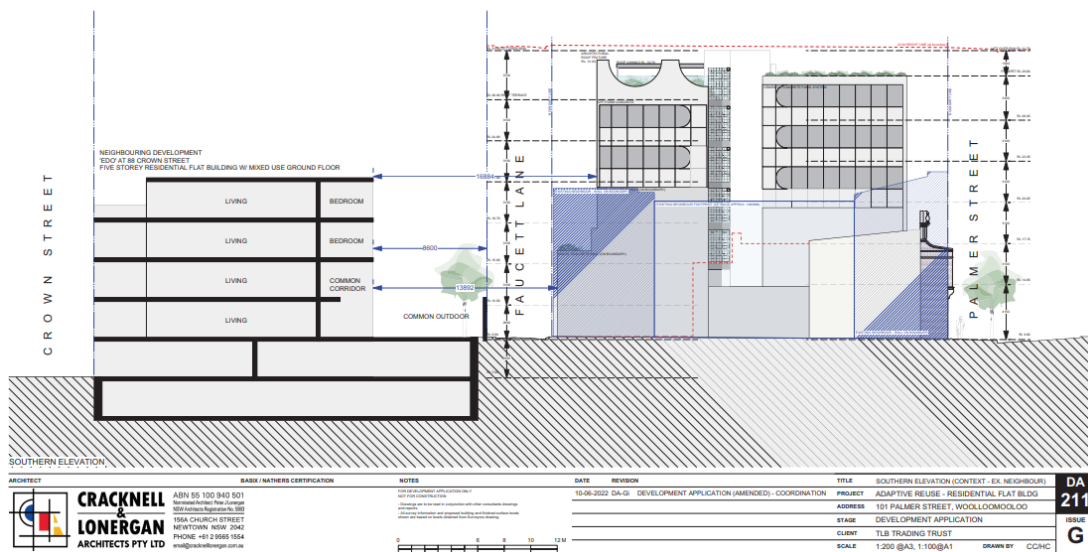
Proposed south context elevation, demonstrating separation distance to 'Edo' at 76-88 Crown St, Woolloomooloo
